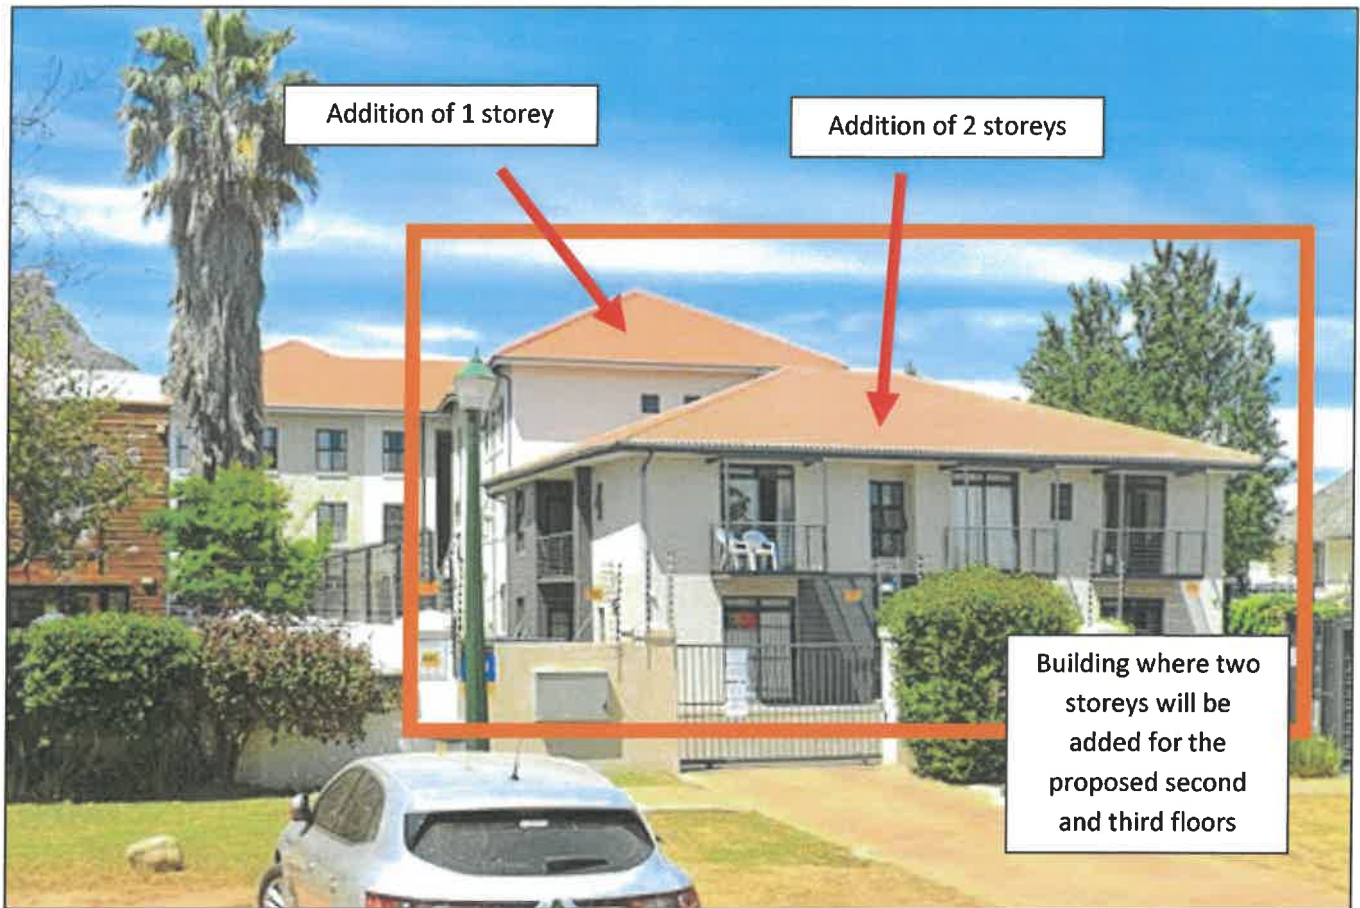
Building where two storeys will be added for the proposed second and third floors
